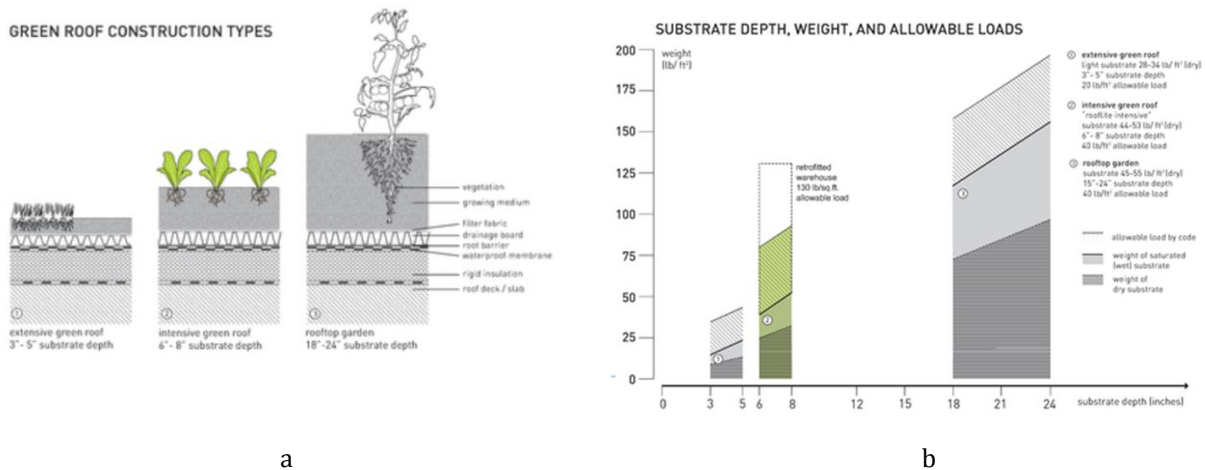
Construction (a) and roof load (b) of the three main green roof types [20]
